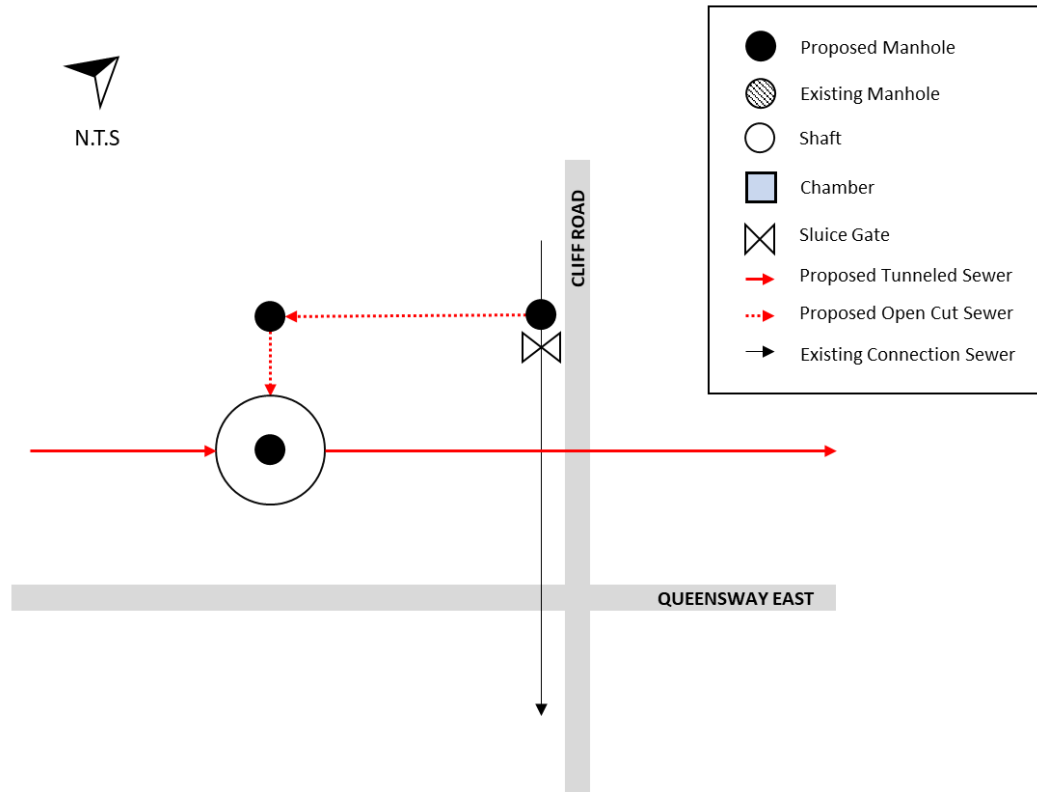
Queensway East and Cliff Road Connection Type Schematic
